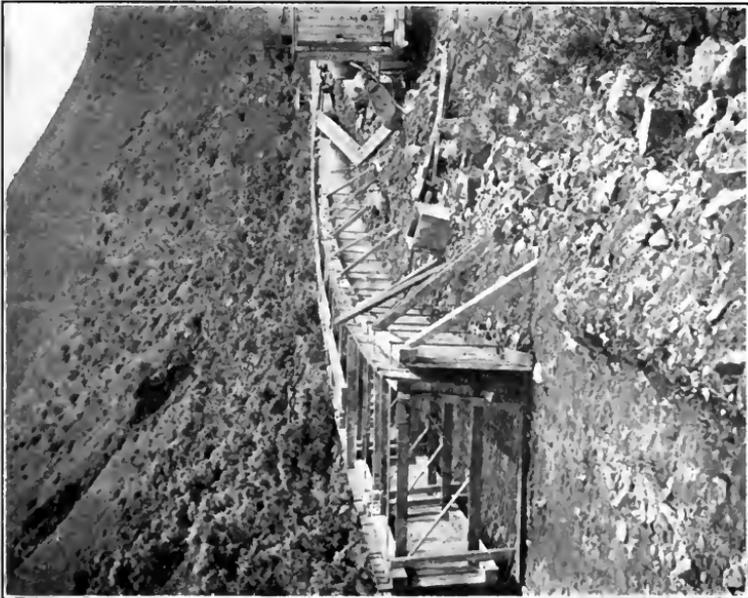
Fig. A.—Forms in place for construction of reinforced concrete bench flume. Kamloops Fruitlands Irrigation & Power Co., B. C.
